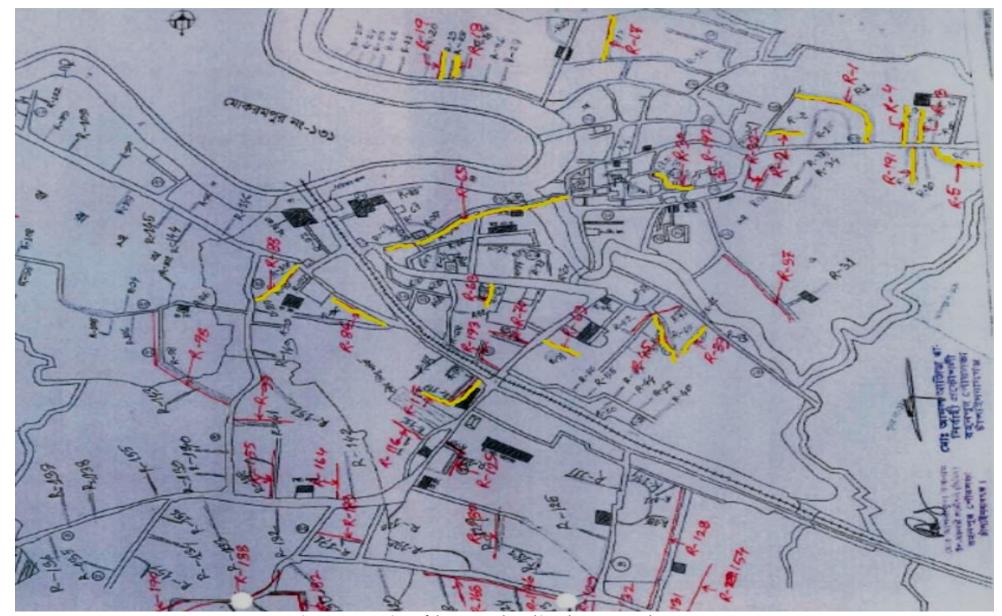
Locations of the Proposed Road in Rohanpur Paurashava
